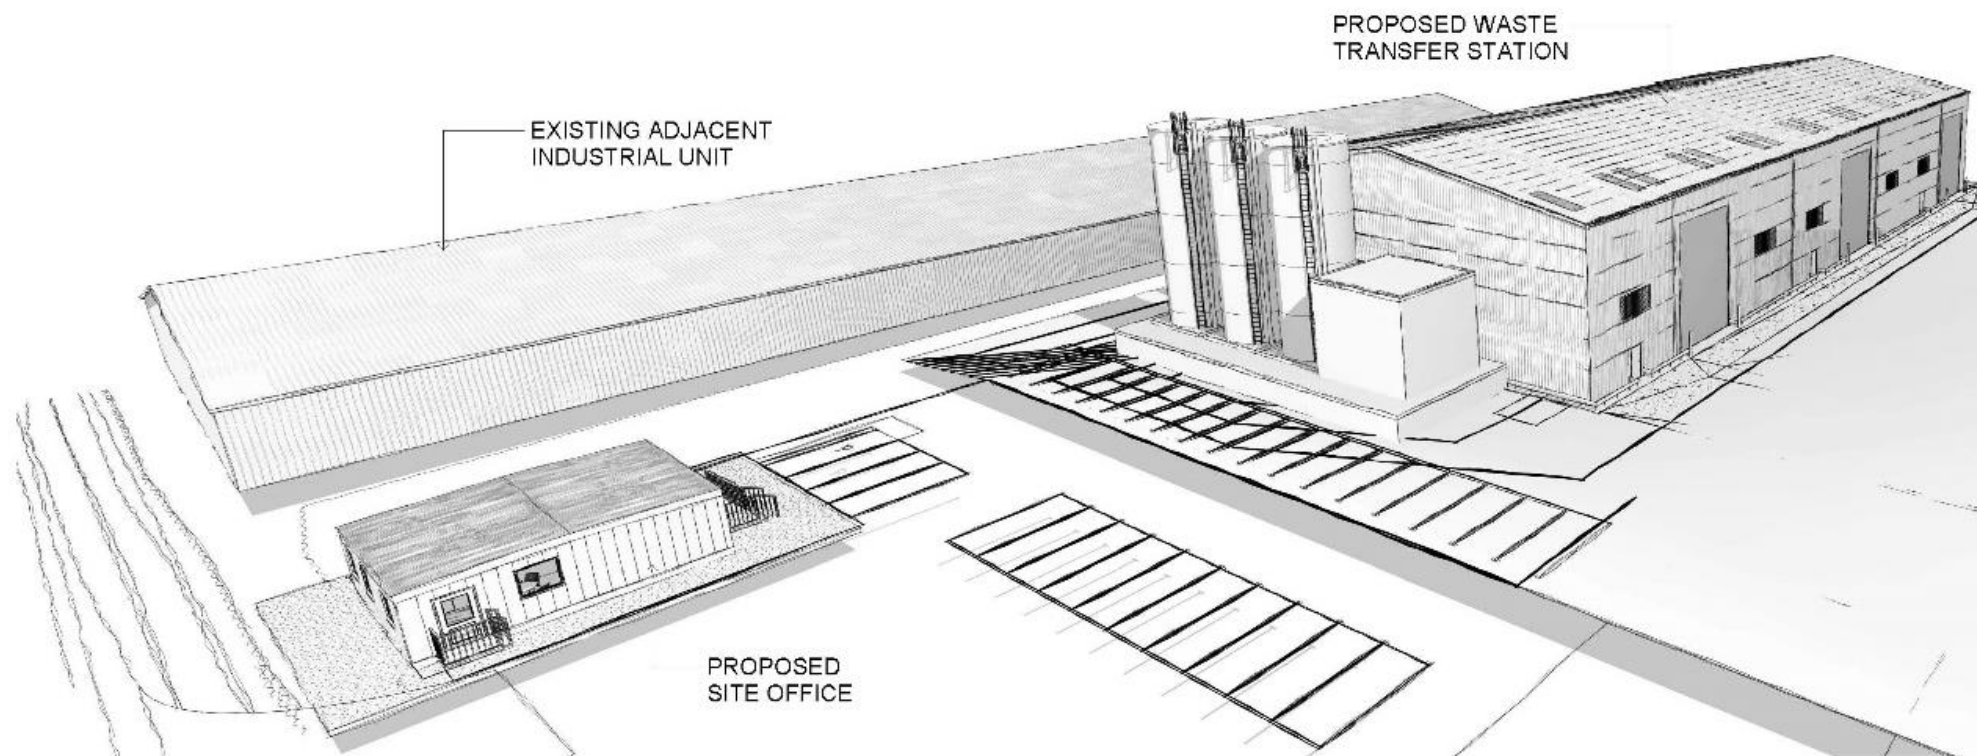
Sketch showing proposed view from the North West of the Site
